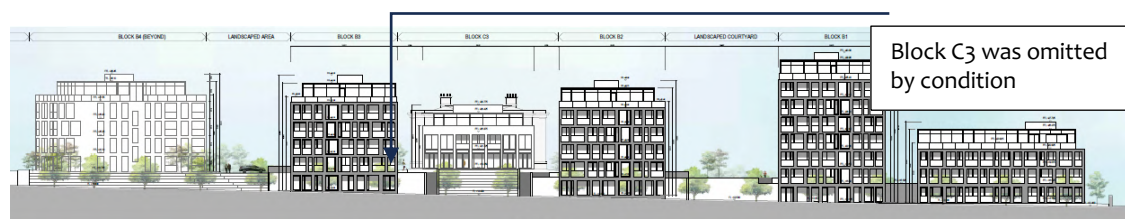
The permitted built frontage to the N31/Temple Road (ABP-303804-19)
